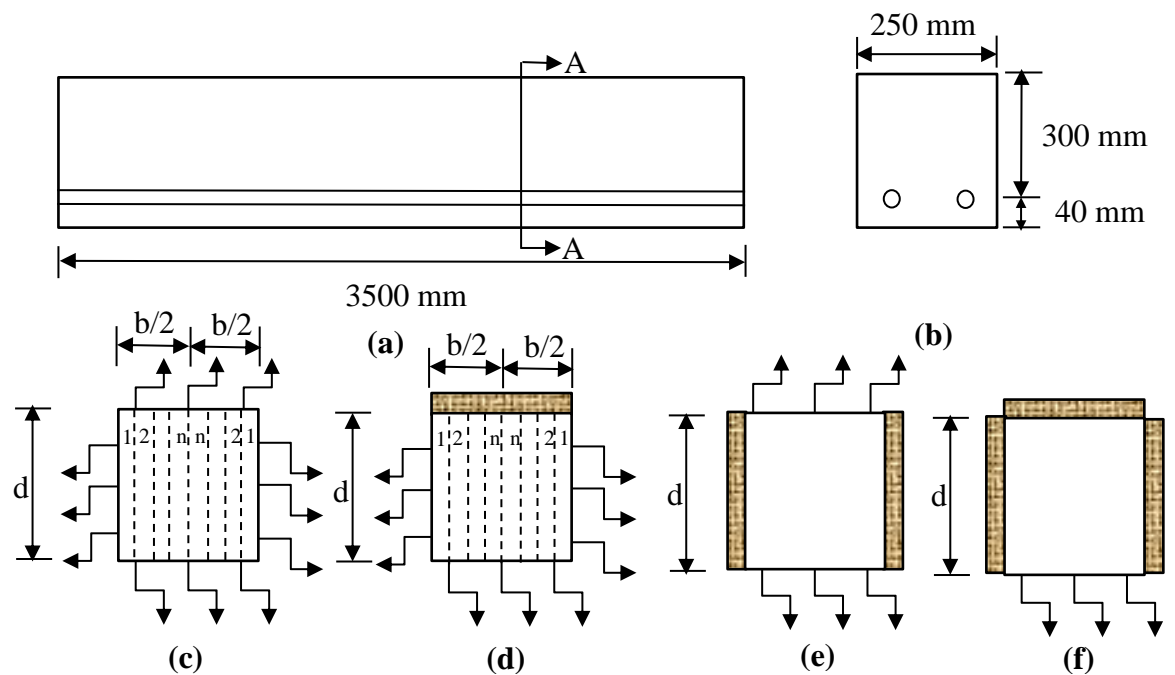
a) Gilbert and Nejadi (2004) Beam B1a b) Sectional elevation of beam B1a at A-A c) Four way flow in beam B1a d) Three way flow in beam B1a e) Two way flow in beam B1a f) One way flow in beam B1a
